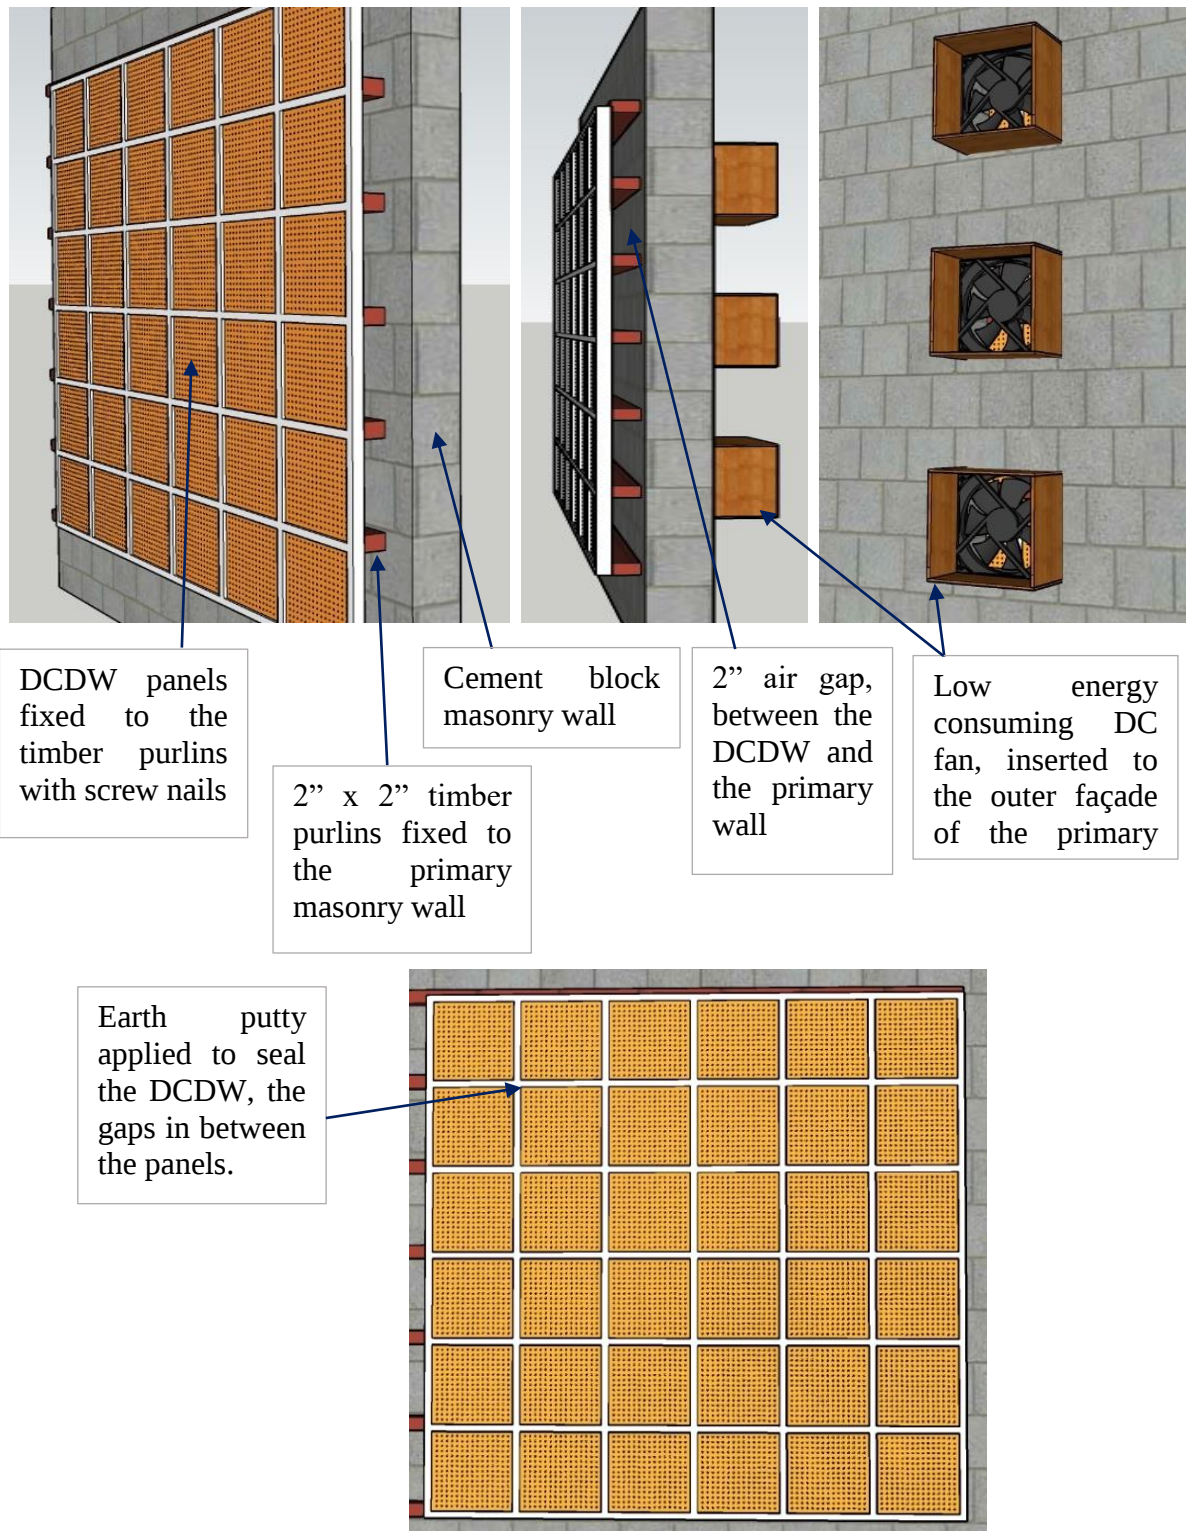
Finalized fixing method of the clay double wall and the fan unit to the primary wall; fired clay Panels are screw-nailed to the horizontal timber poles fixed to the primary wall
